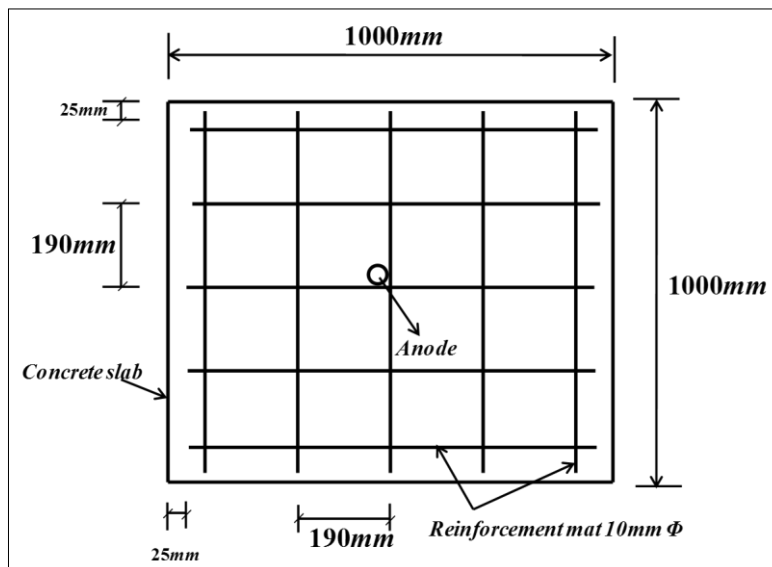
Detailing of reinforcement spacing and position of anodes for all four slabs
